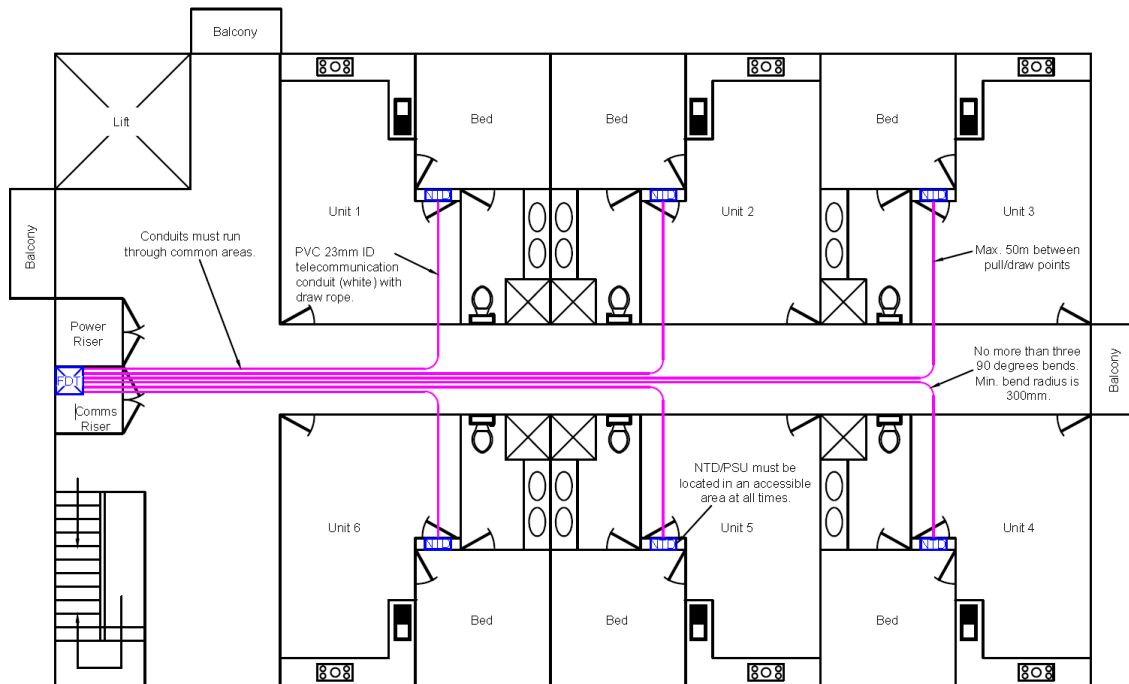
nbn™ pathway using all nominal P20 conduit to feed typical apartment floor (example layout 1)
